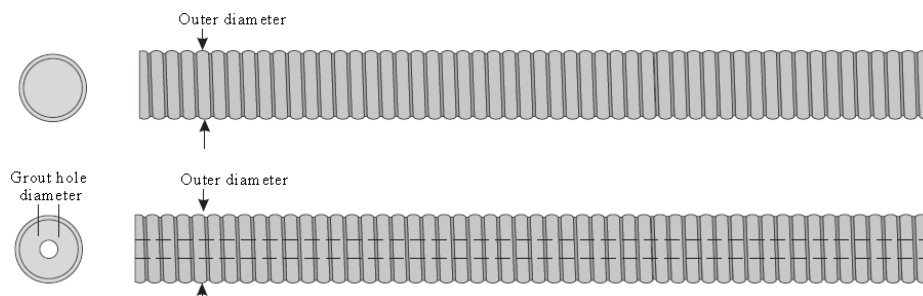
Solid and hollow bar fibreglass rock bolts with threaded form [20]
